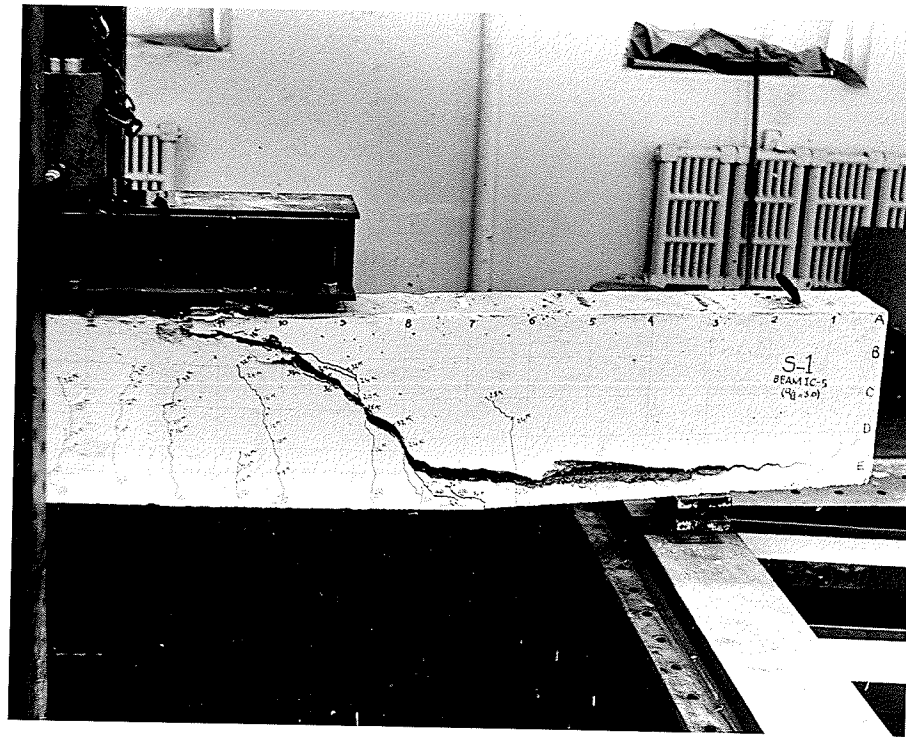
DIAGONAL FAILURE OF BEAM IC-5
